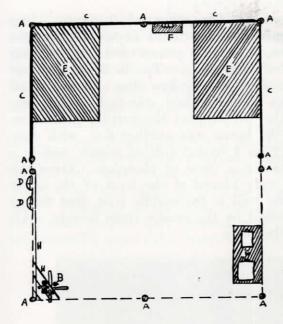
El Encanto, Chis. Bac (Scale 3:100). Bachajon House, Plan.
